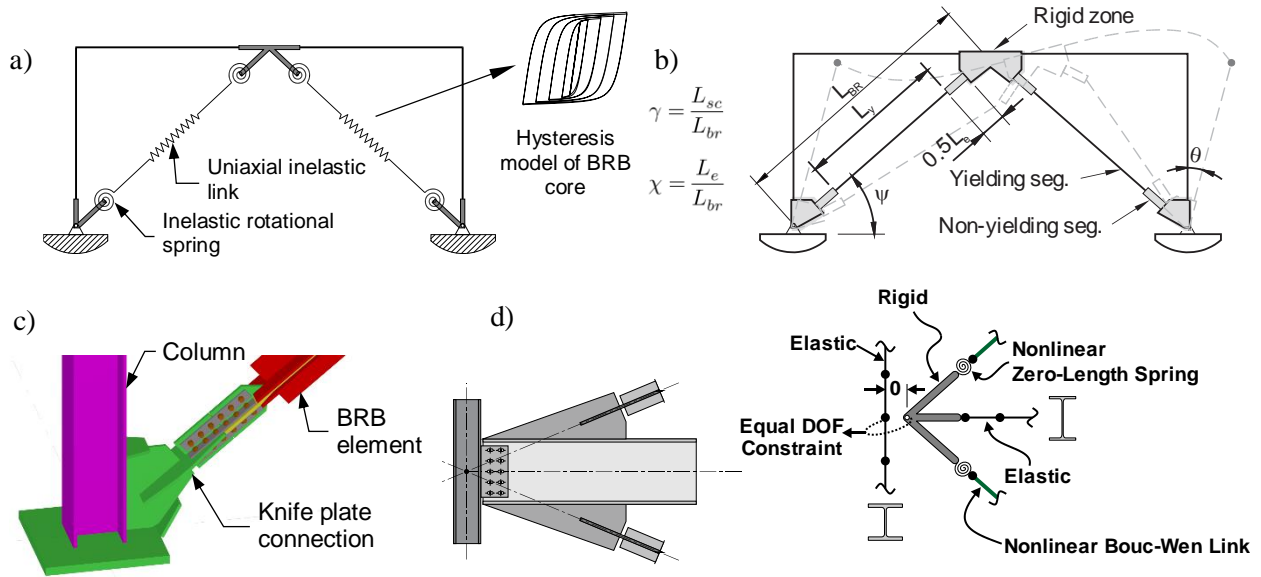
a) conceptual modelling of BRBF; b) graphical definition of brace geometry; c) modelling of beam-and-brace-to-column hinge connection; and d) pin brace-to-gusset plate connection.
